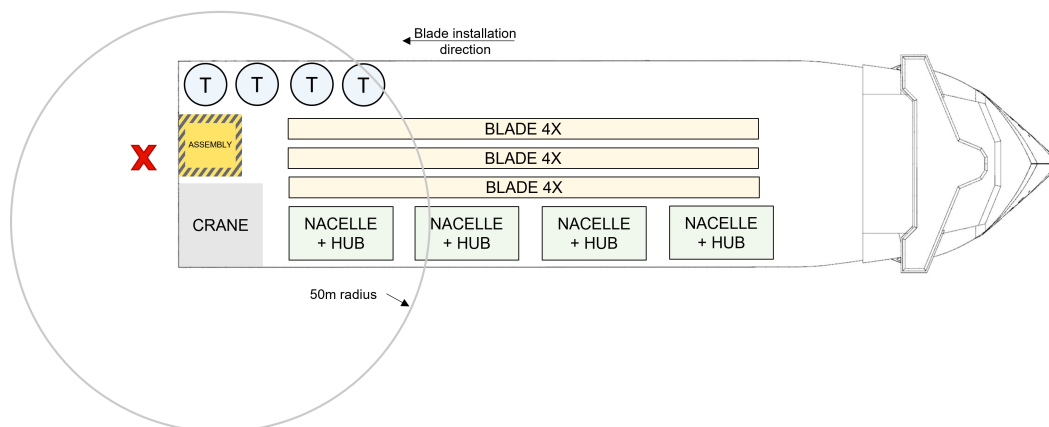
Deck layout 1 showing the positioning of components, crane, assembly location, and installation position.
